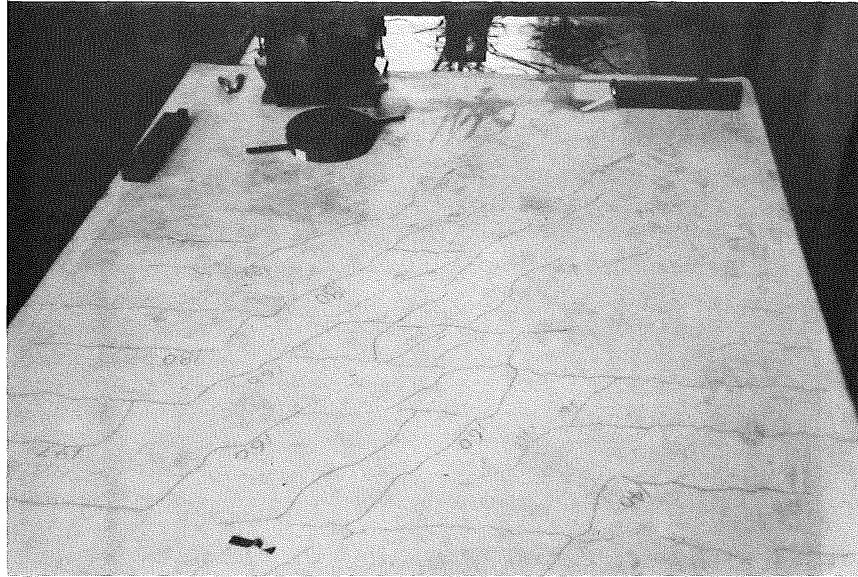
Cracks on Concrete Deck Surface over End Panel,
